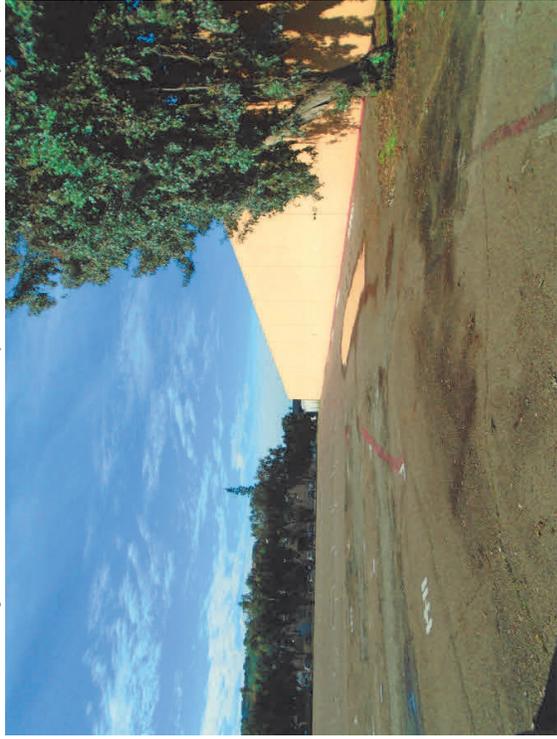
Photo C: View looking towards the southwest corner of the Project site, from the northwest corner of the Project site
